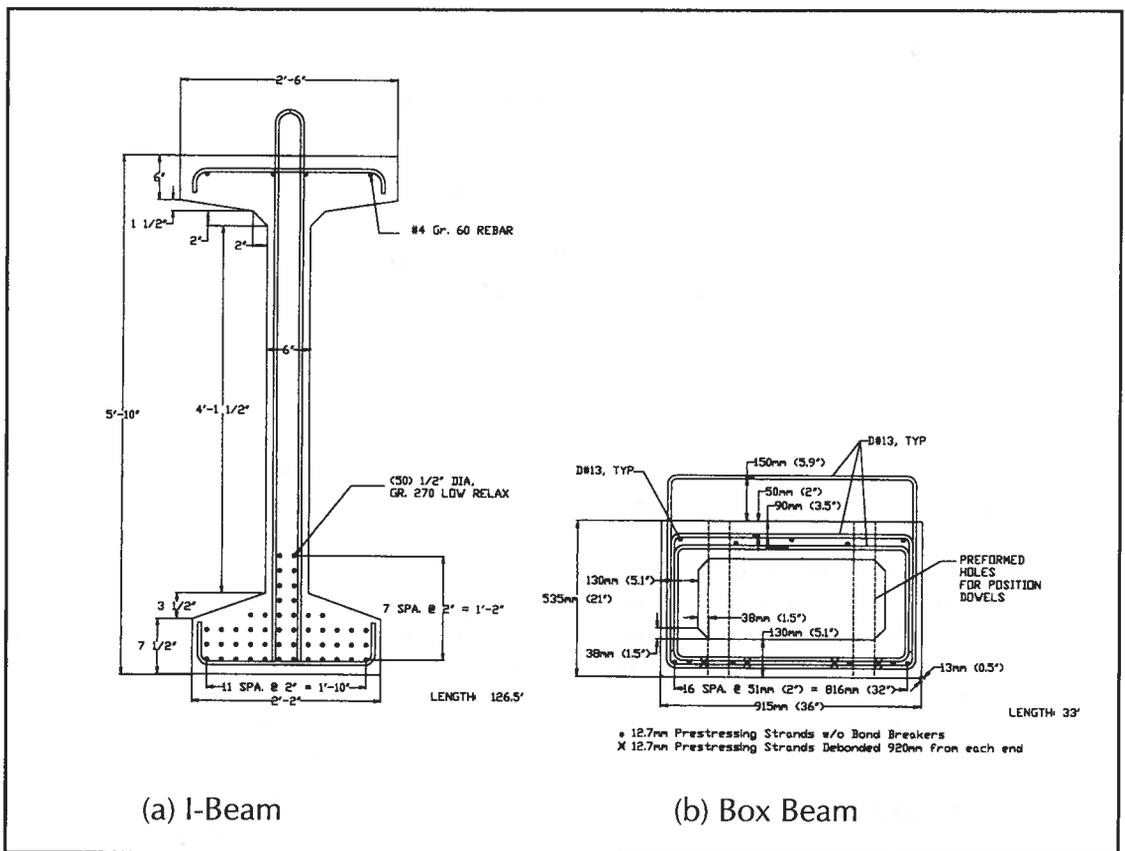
Cross sections of beams considered showing dimensions and reinforcing details.
